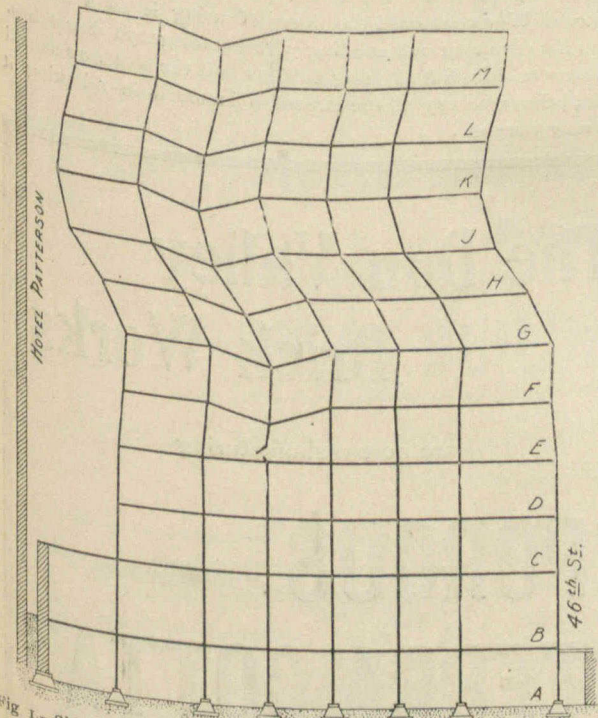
Side Elevation of the Steel Frame, showing in slightly exagge ated form the failure of the column on the fourth floor, resulting in the collapse of the structure above it, which crashed through the lower portion of the building. The break occurring just back of the centre of the floor, the structure had a natural tendency to fall toward its centre, the greater amount of metal in the front, however, pushing the rear portion backward.
